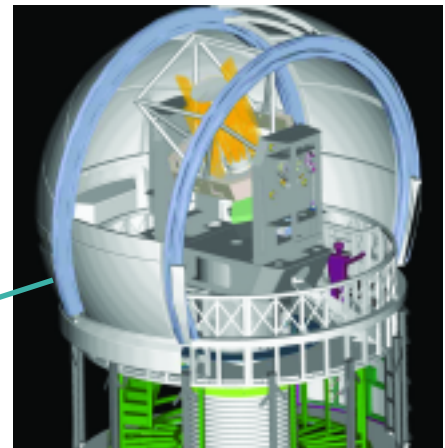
PS1 Telescope Dome installation pictorial (UH IfA).
